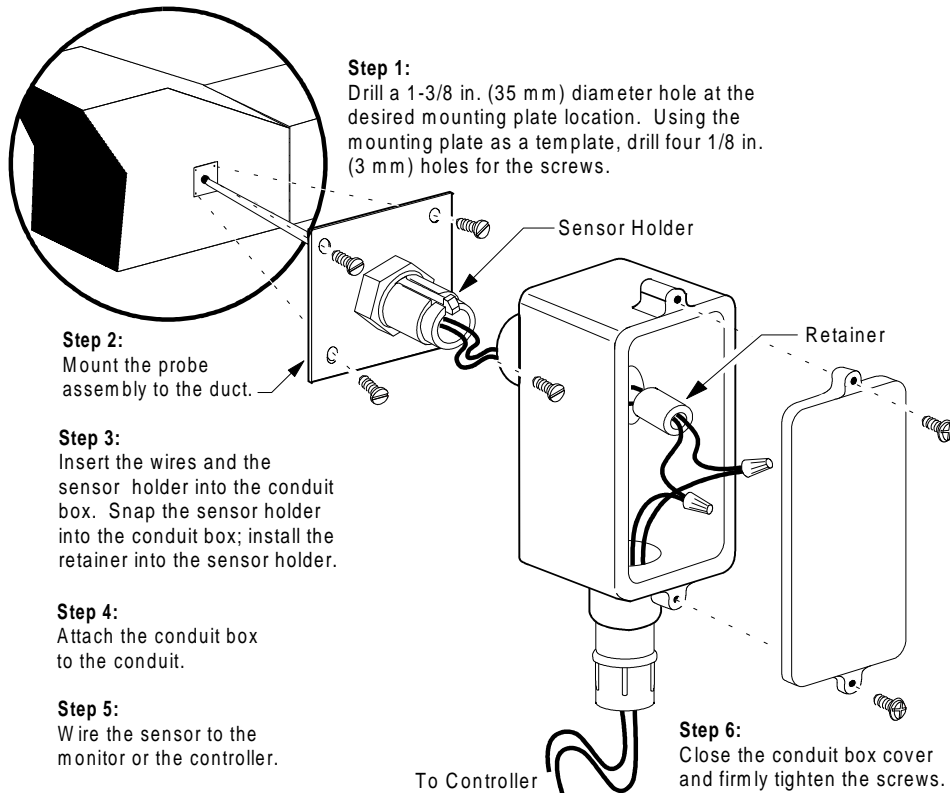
Installing the Duct Sensor Using the Sensor Holder and Retainer
